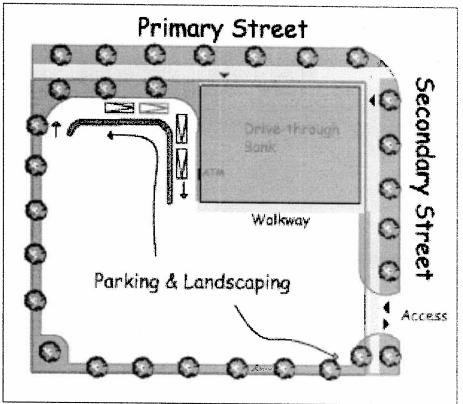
Corner site provides an access point into the site away from the intersection as well as being from a secondary street.
